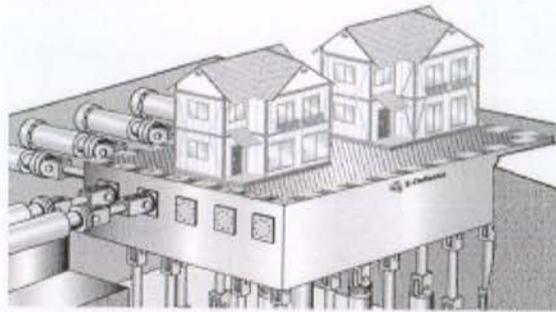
Schematic view of Japanese-style wooden houses on the shake table (Sato and Inoue 2004)
